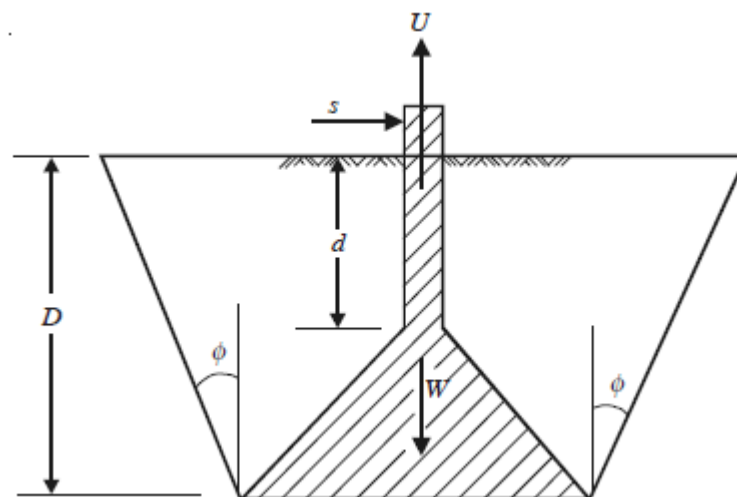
Chimney and pad foundation for transmission line towers. Forces acting on the foundation.
